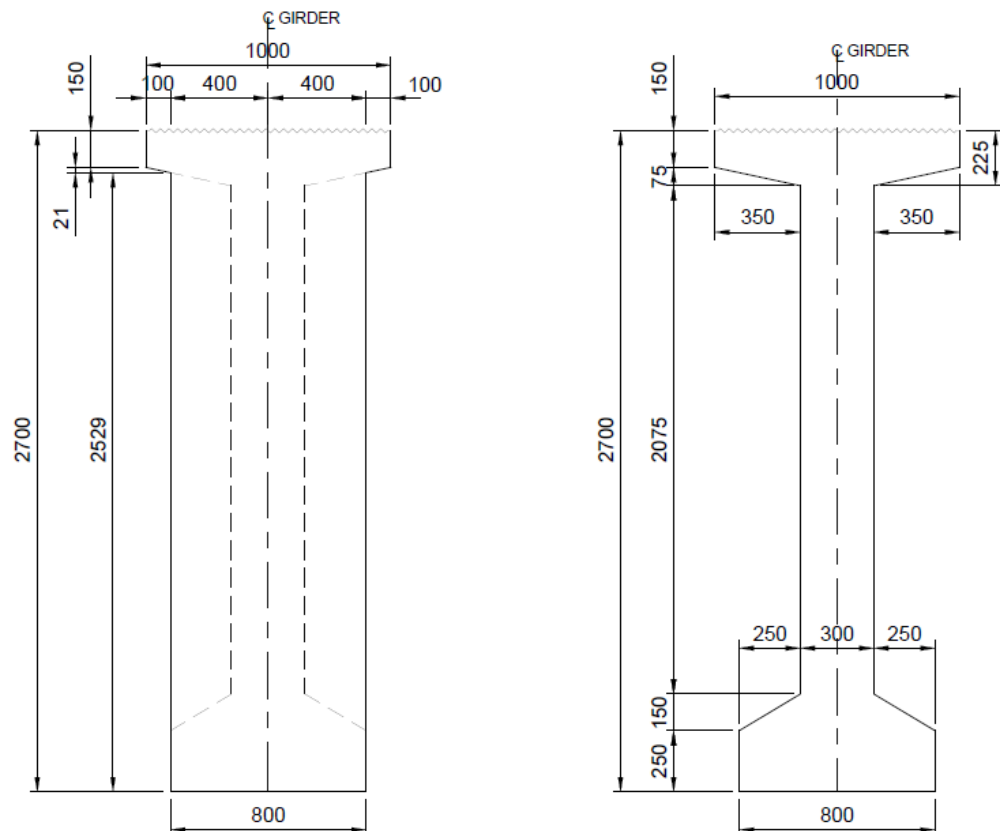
20 Girder section of 45m span OC post tensioned I girder at support and mid span
